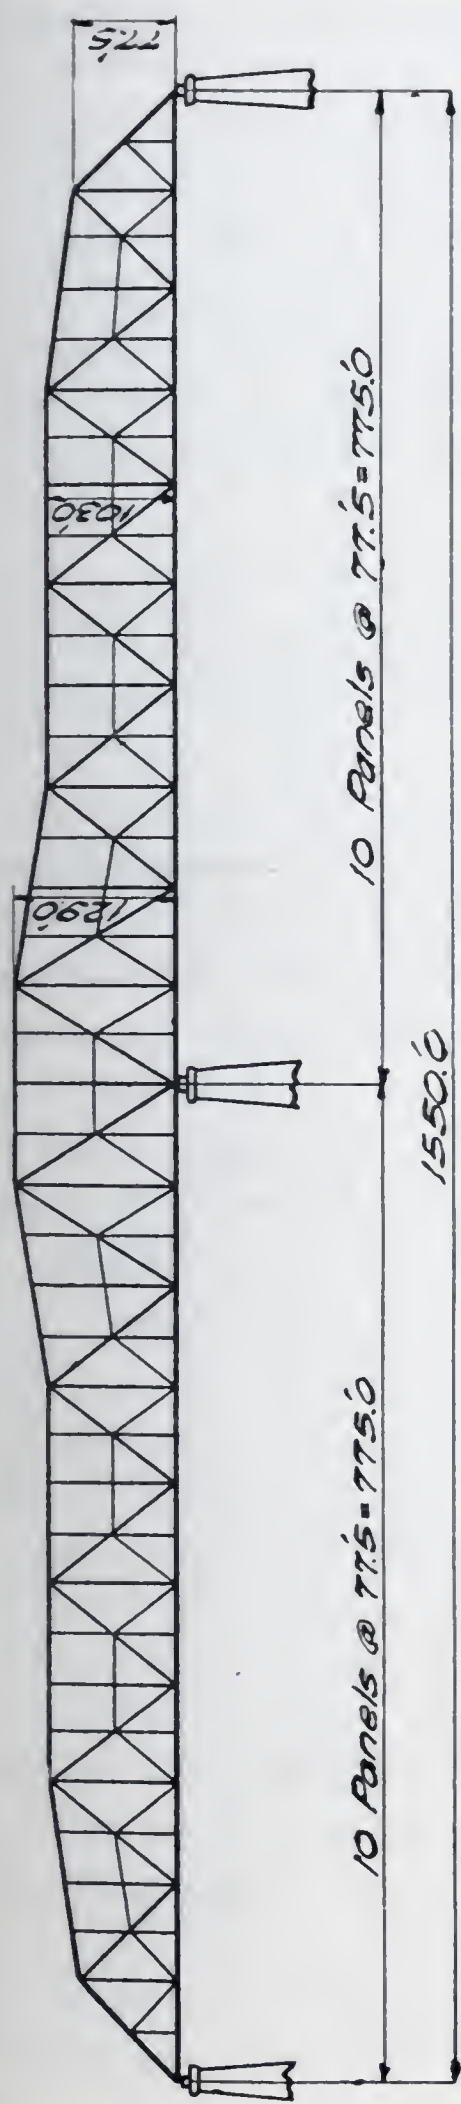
Lay-Out of Subdivided-Triangular Truss, Continuous Spans.
